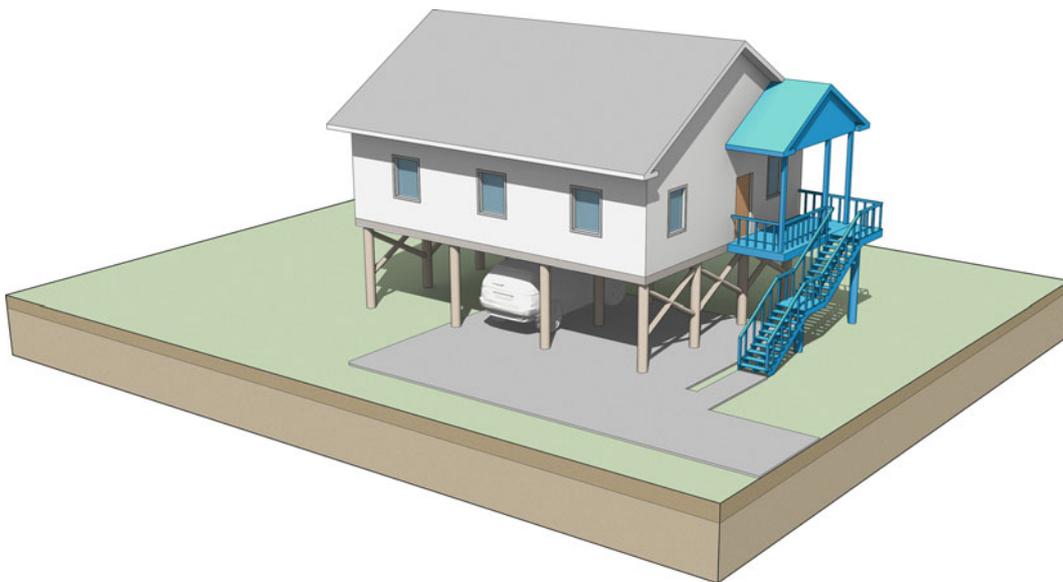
Diagram of an elevated structure on piles with stairs (Credit: Giovanni Coakley, LSU School of Architecture)
